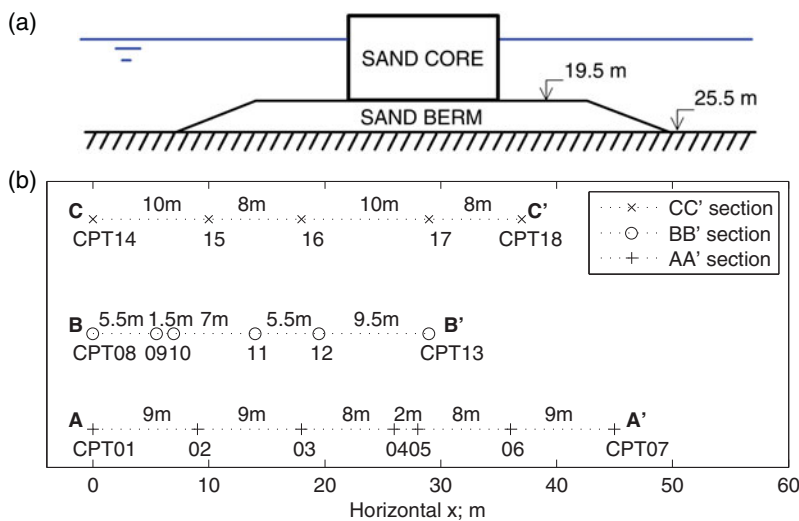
Test site: (a) side view sketch of Tarsuit P-45 core and berm (not to scale) and (b) plan view of CPT locations used.
